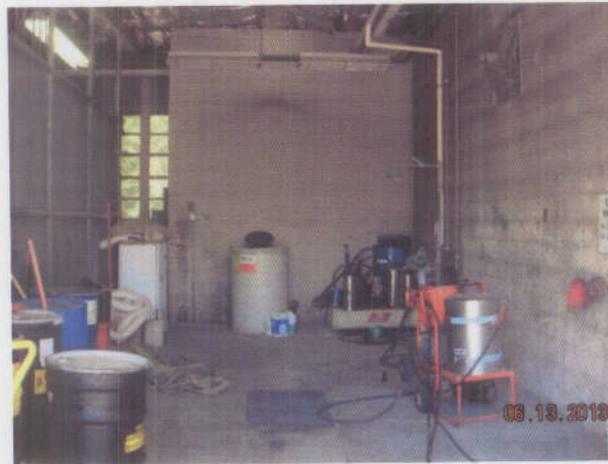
North bay, site of proposed brine water treatment system at Camp Connell MS
